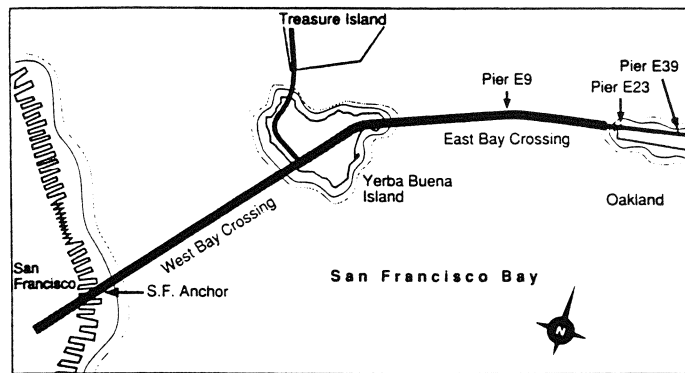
Plan and Aerial View of the San Francisco-Oakland Bay Bridge
